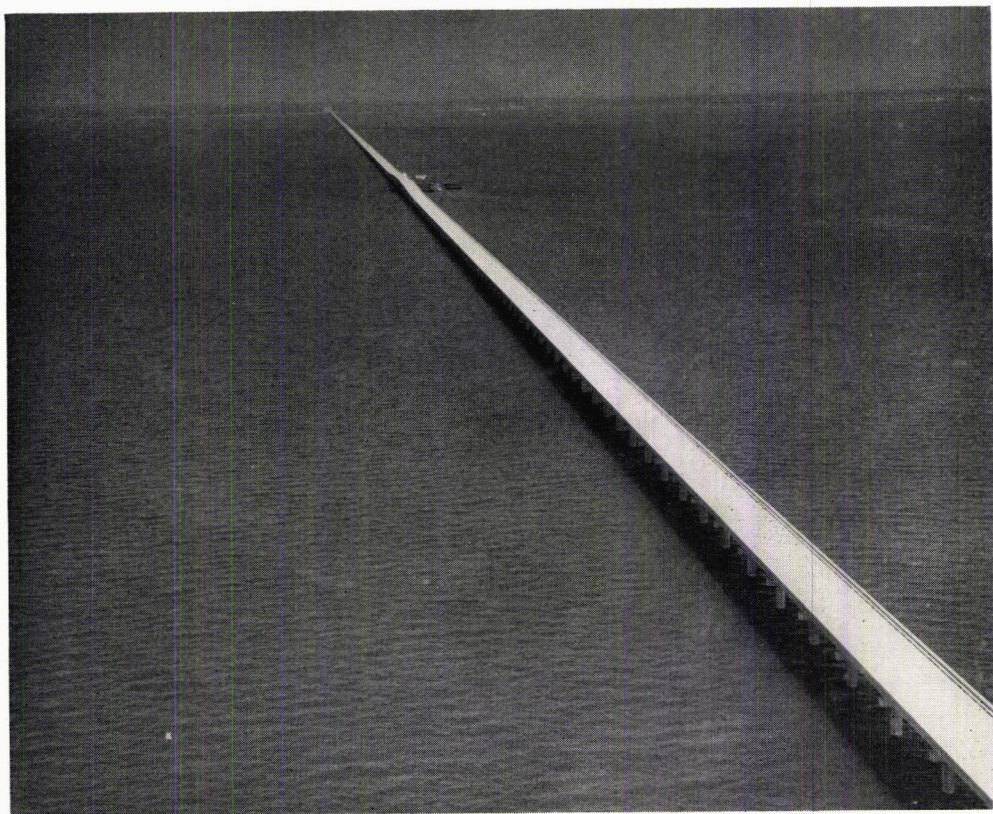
View of Lake Pontchartrain Bridge looking towards north shore.
